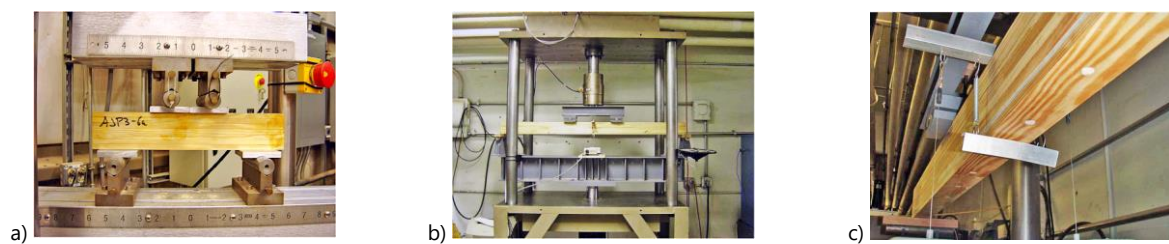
Tests performed by Gentry (2011): a) bending/shear test; b) four-point bending test; c) small-scale bending specimen with GFRP longitudinal and vertical reinforcements.
